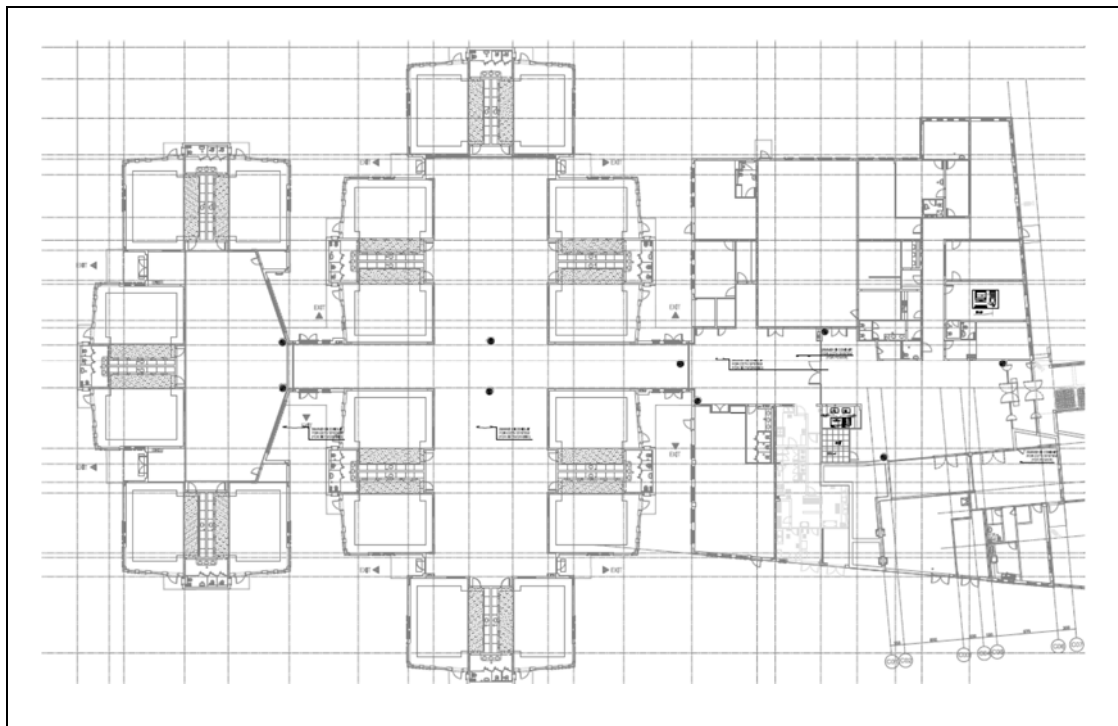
Ground Floor Plan Thumbnail of Building-2
